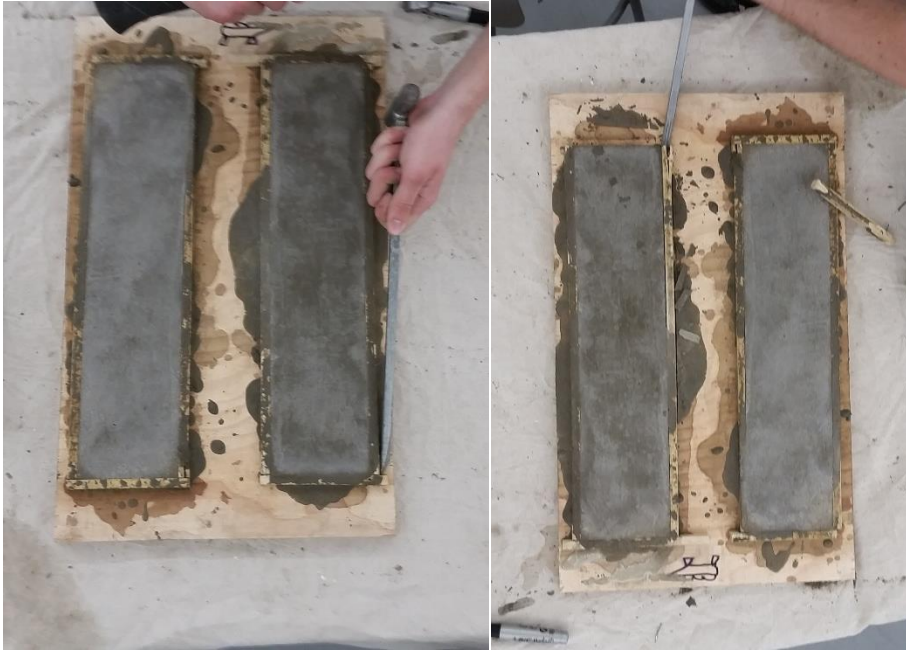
Right (a) Removing first end piece; Left (b) Removing first side piece
